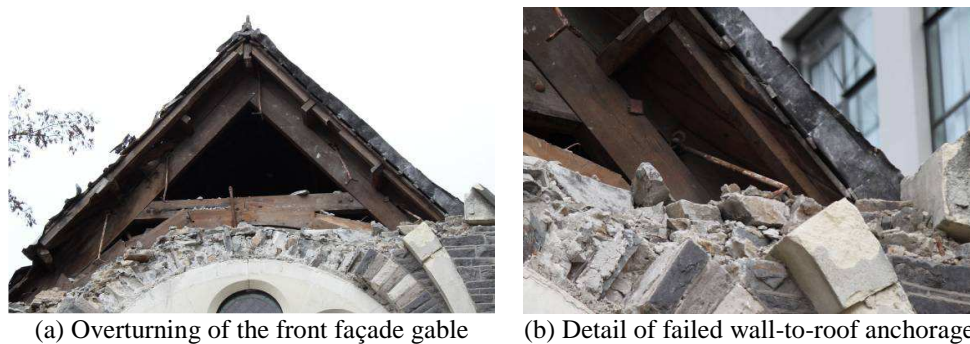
Former Trinity Church, showing details of gable ended out-of-plane wall failure
